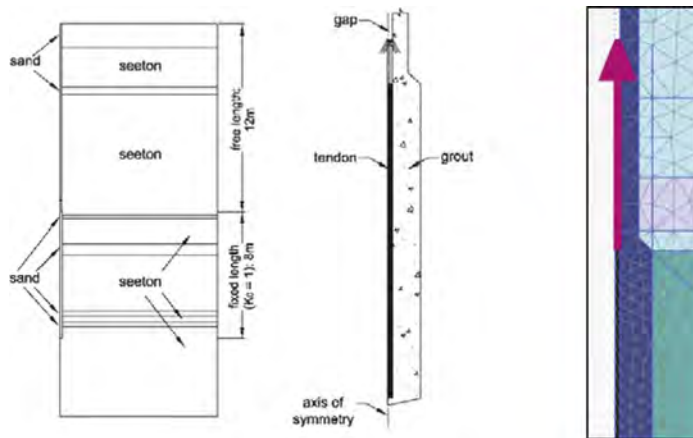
Numerical model: geometry, anchor detail, detail of finite element mesh.
